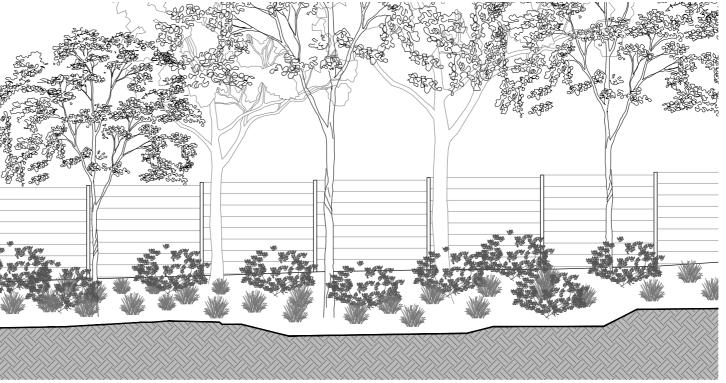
Proposed Noise Wall Design: Elevation - Residential Side
